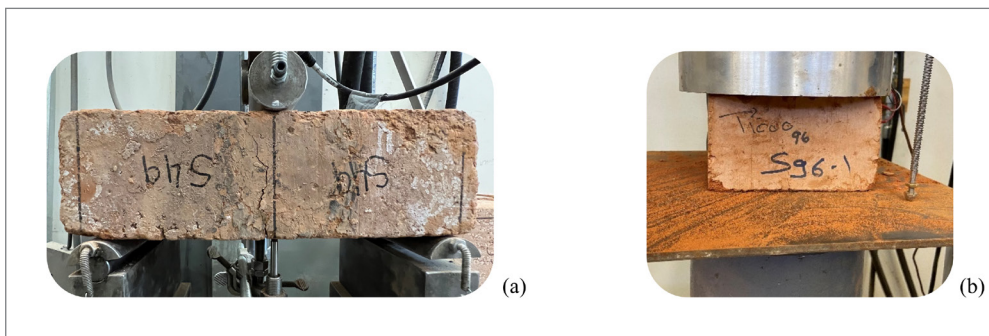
Mechanical tests: (a) specimen after flexure test and (b) specimen after compression test.
